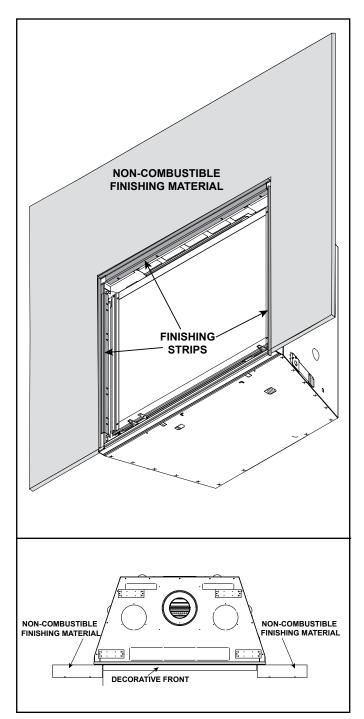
Non-Combustible Finishing Material Thickness Greater Than One Inch - Finishing Strips Required
